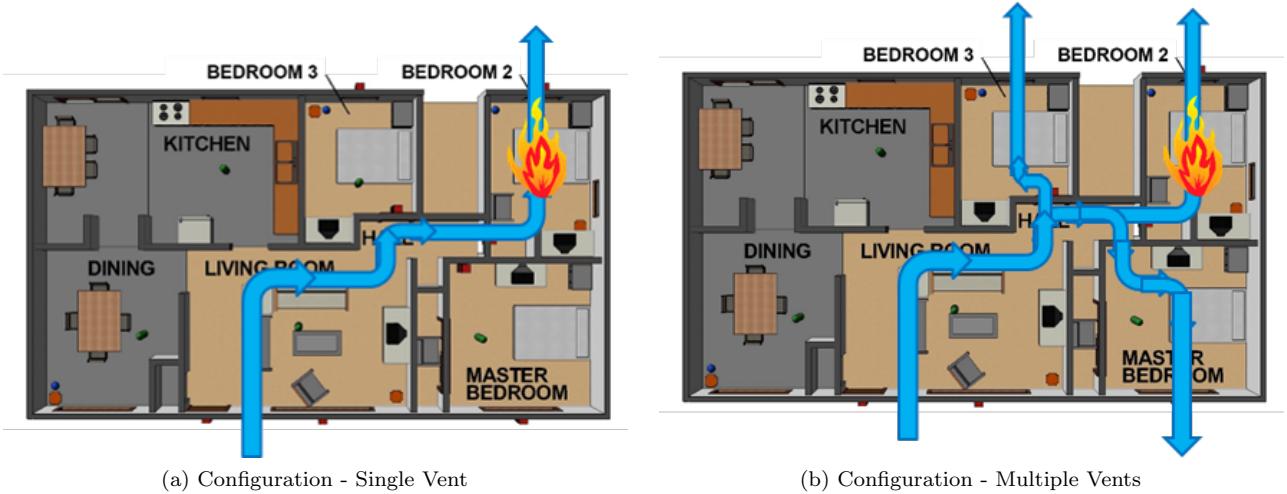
Additional Ventilation Outside the Fire Compartment
